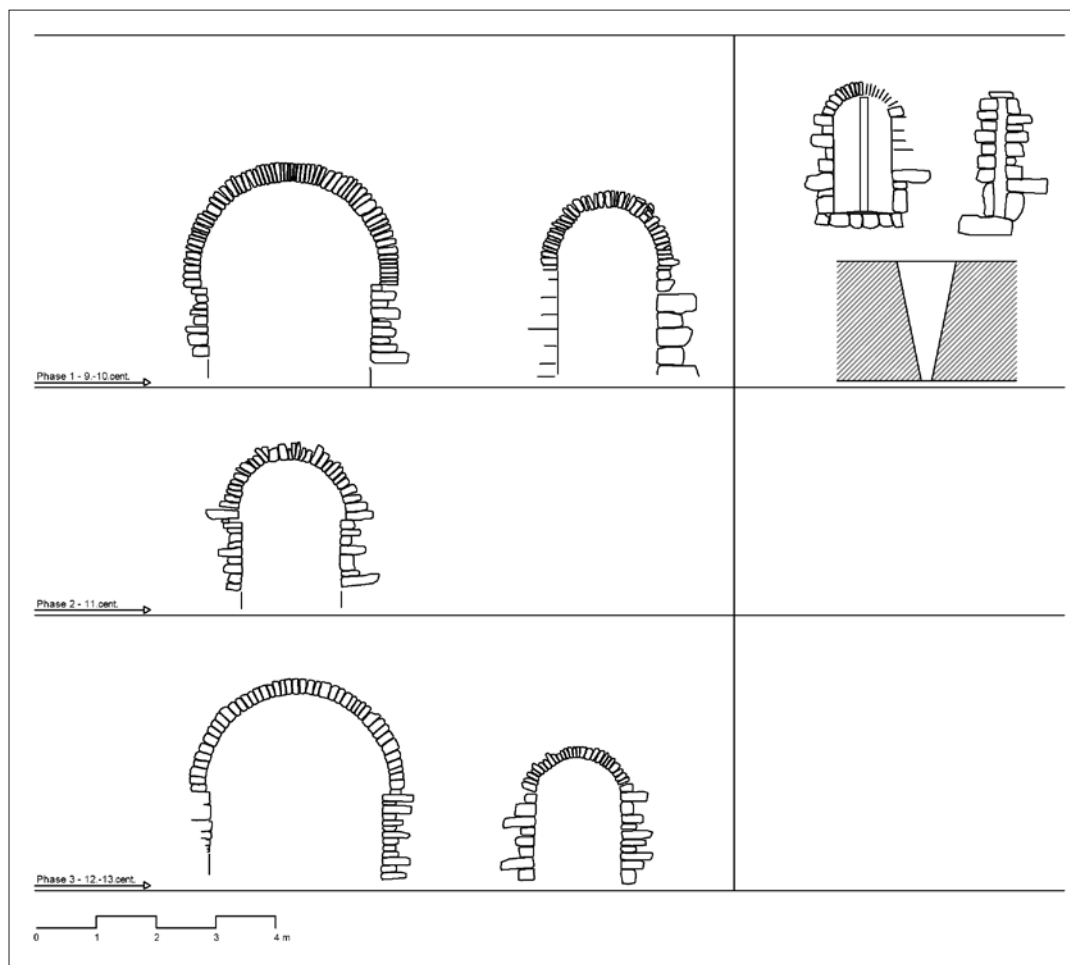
Typology of preserved wall openings of Turnina (drawing by: J. Višnjić)
